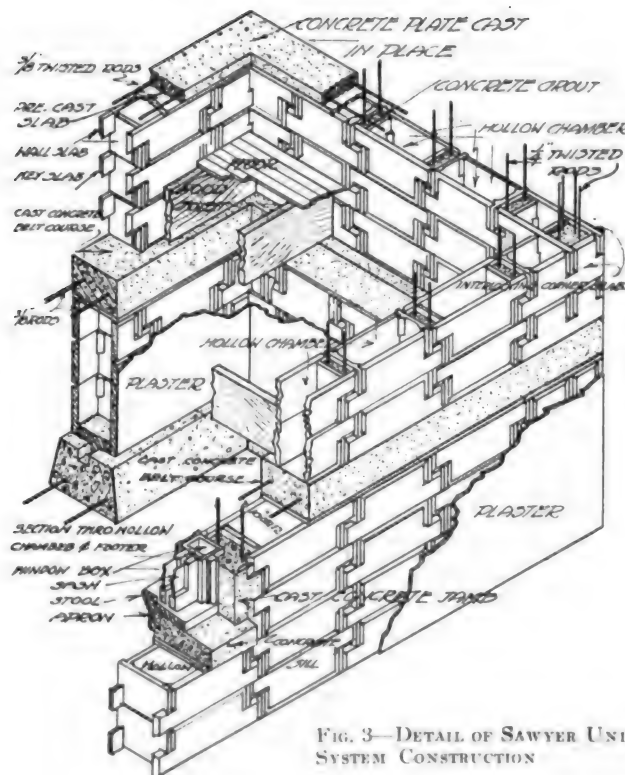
DETAIL OF SAWYER UNIT SYSTEM CONSTRUCTION
